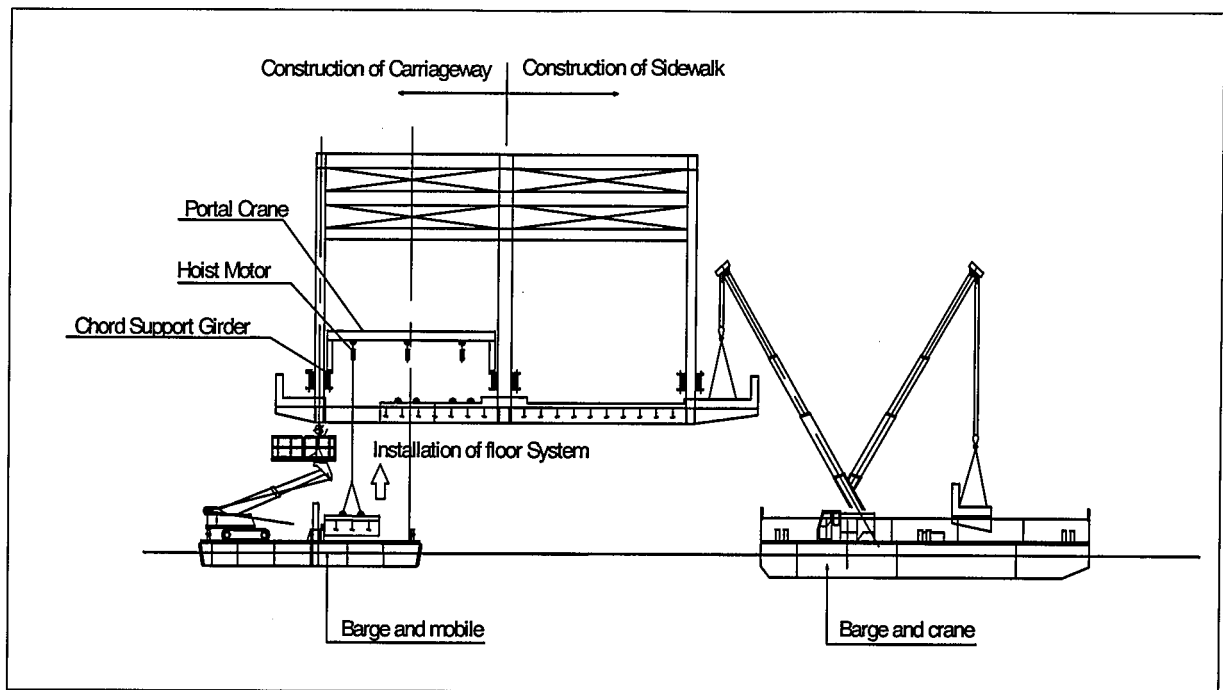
Utilization of Traveling Crane Truck
